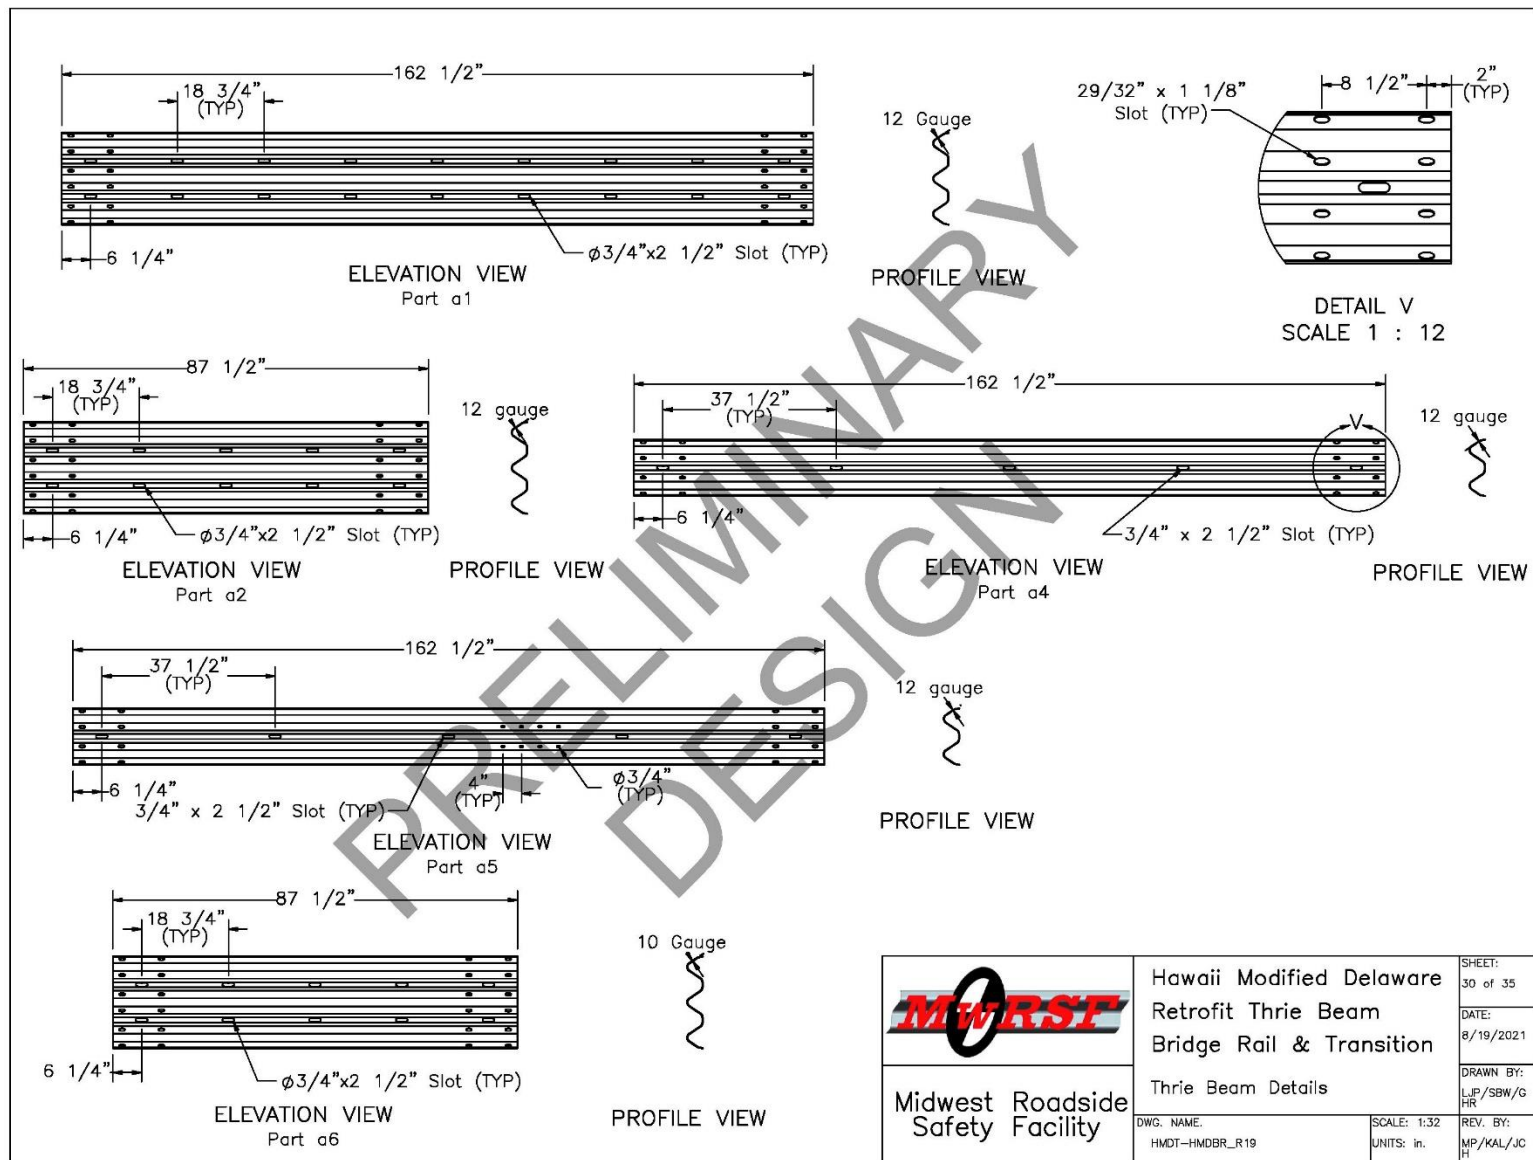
Thrie-Beam Rail Details, Test No. HMDT-1
